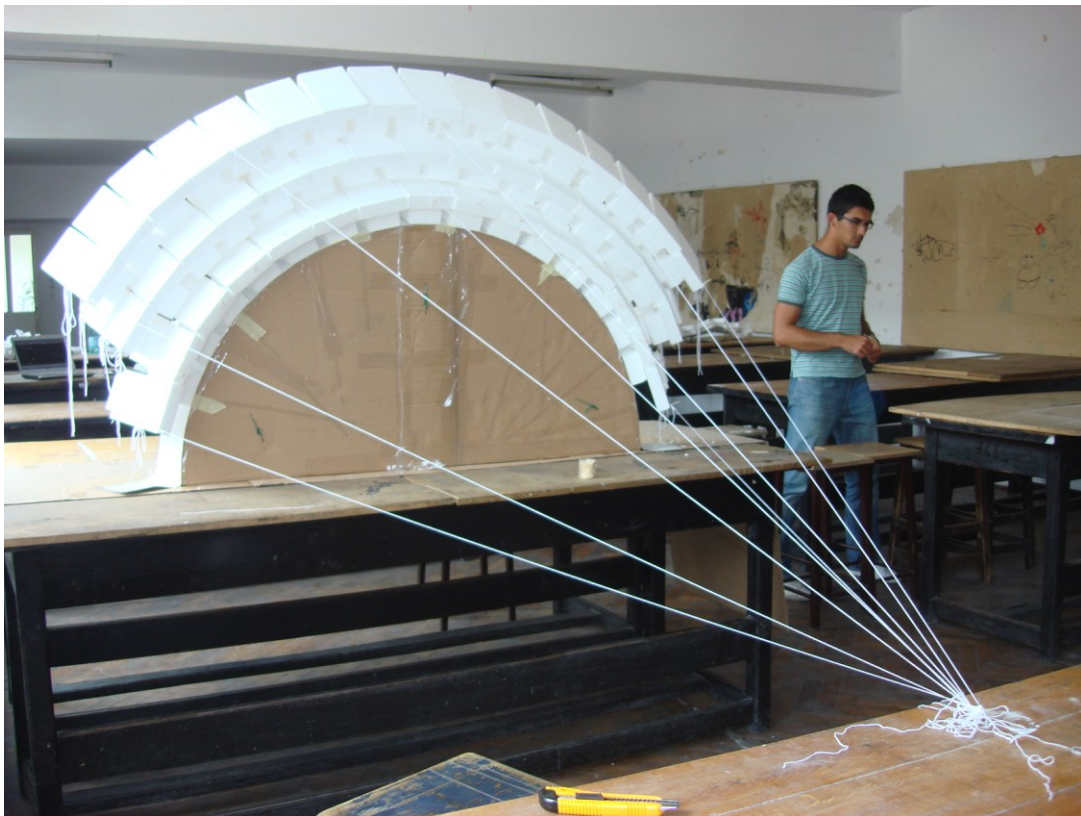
Scale 1/1 model of an arcade for the reconstruction of the drum and dome on the church in Berislavesti, back view with radial configuration suggested with strings
